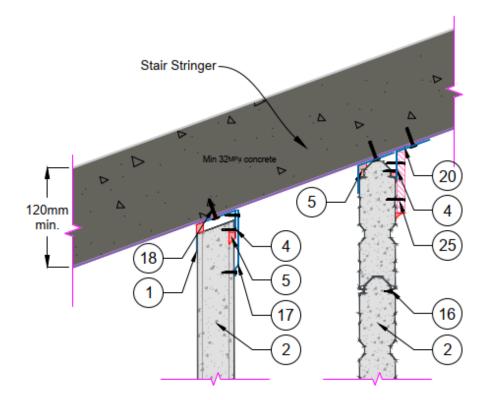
Vertical or horizontal Speedpanel wall under stair stringer (section view)
